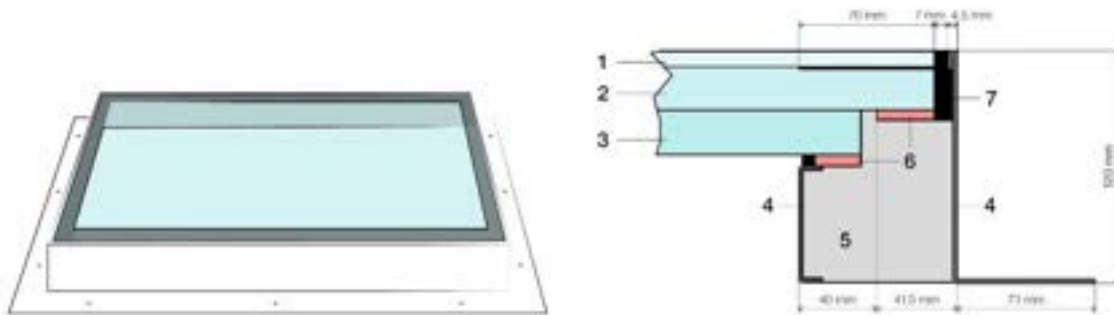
Glassfloor Pure, isolated: 1 - coverglass, 2 - static LSG, 3 - Interior ISO LSG, 4 - Stainless steel frame, 5 – Insulated stainless steel profile, 6 - Glass support, 7 - Seal/joint , (LSG - Measurement of air permeability under pressure)
